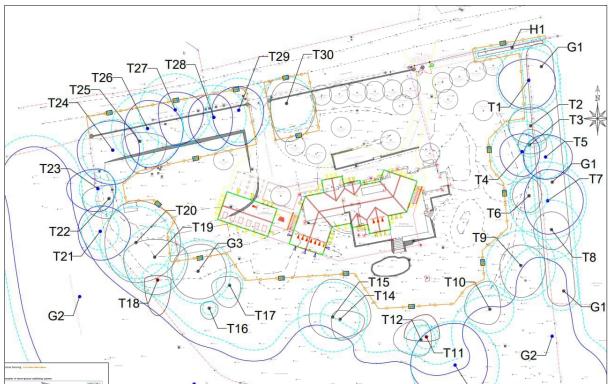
Extract from Tree Protection Plan showing in light blue the intended location of Tree Protection Fencing
